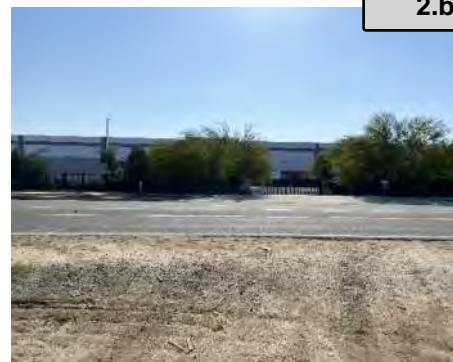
Looking west towards Indian Street from unpaved Goya Avenue at the Goya Avenue and Indian Street intersection.
